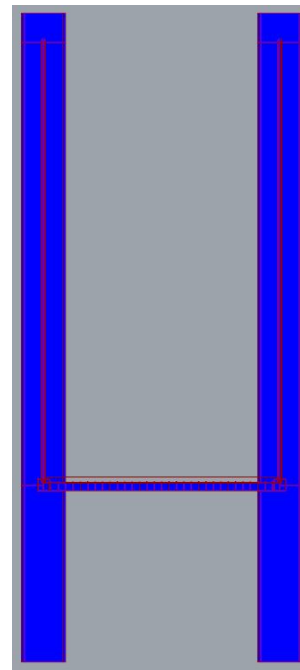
Cross-section of the single pylon cable stayed bridge as modelled with Karamba
